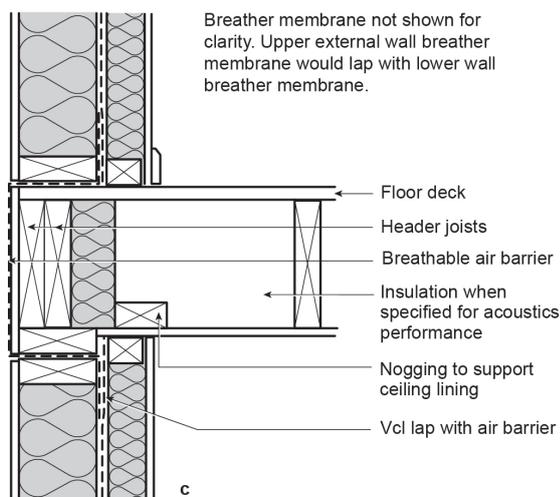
Floor/external wall junction showing panel extending beyond room perimeter under the wall
